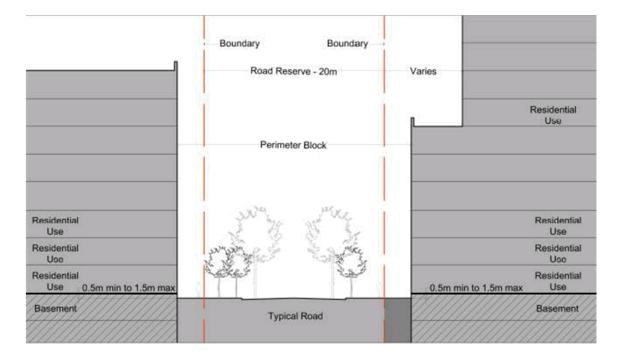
Street Wall Height at Typical East West Street, NTS
